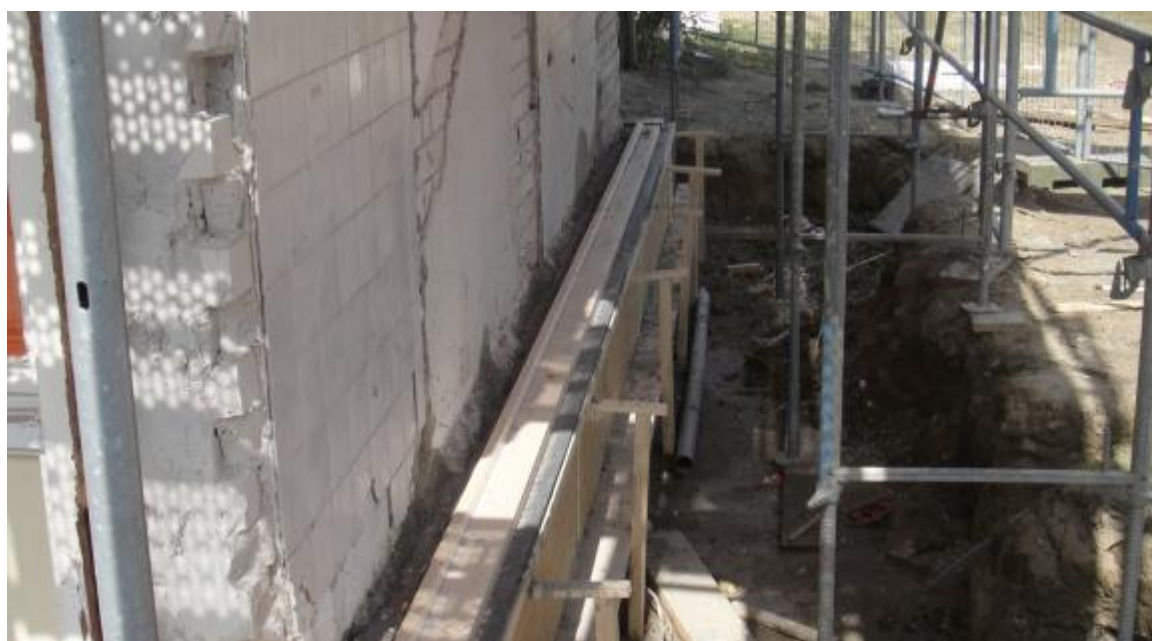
Foundation prepared: ready for installation of prefabricated façade element.
